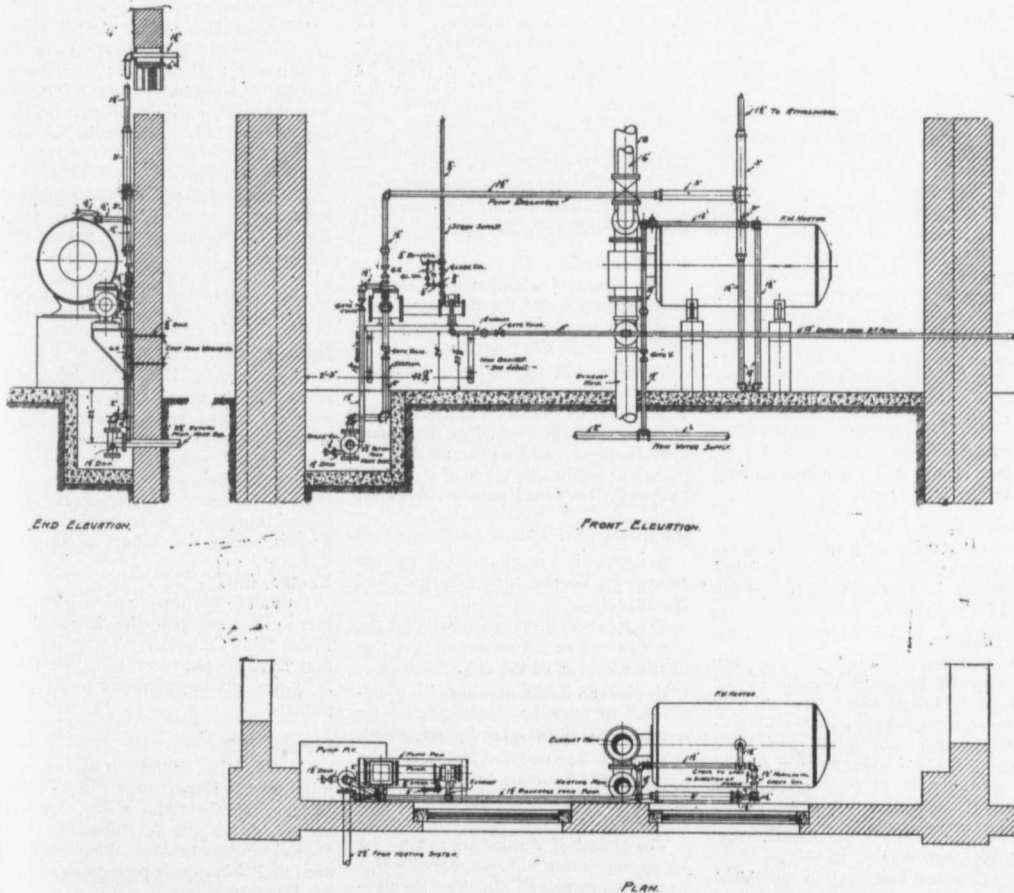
VACUUM PUMP CONNECTIONS AND DETAILS.
